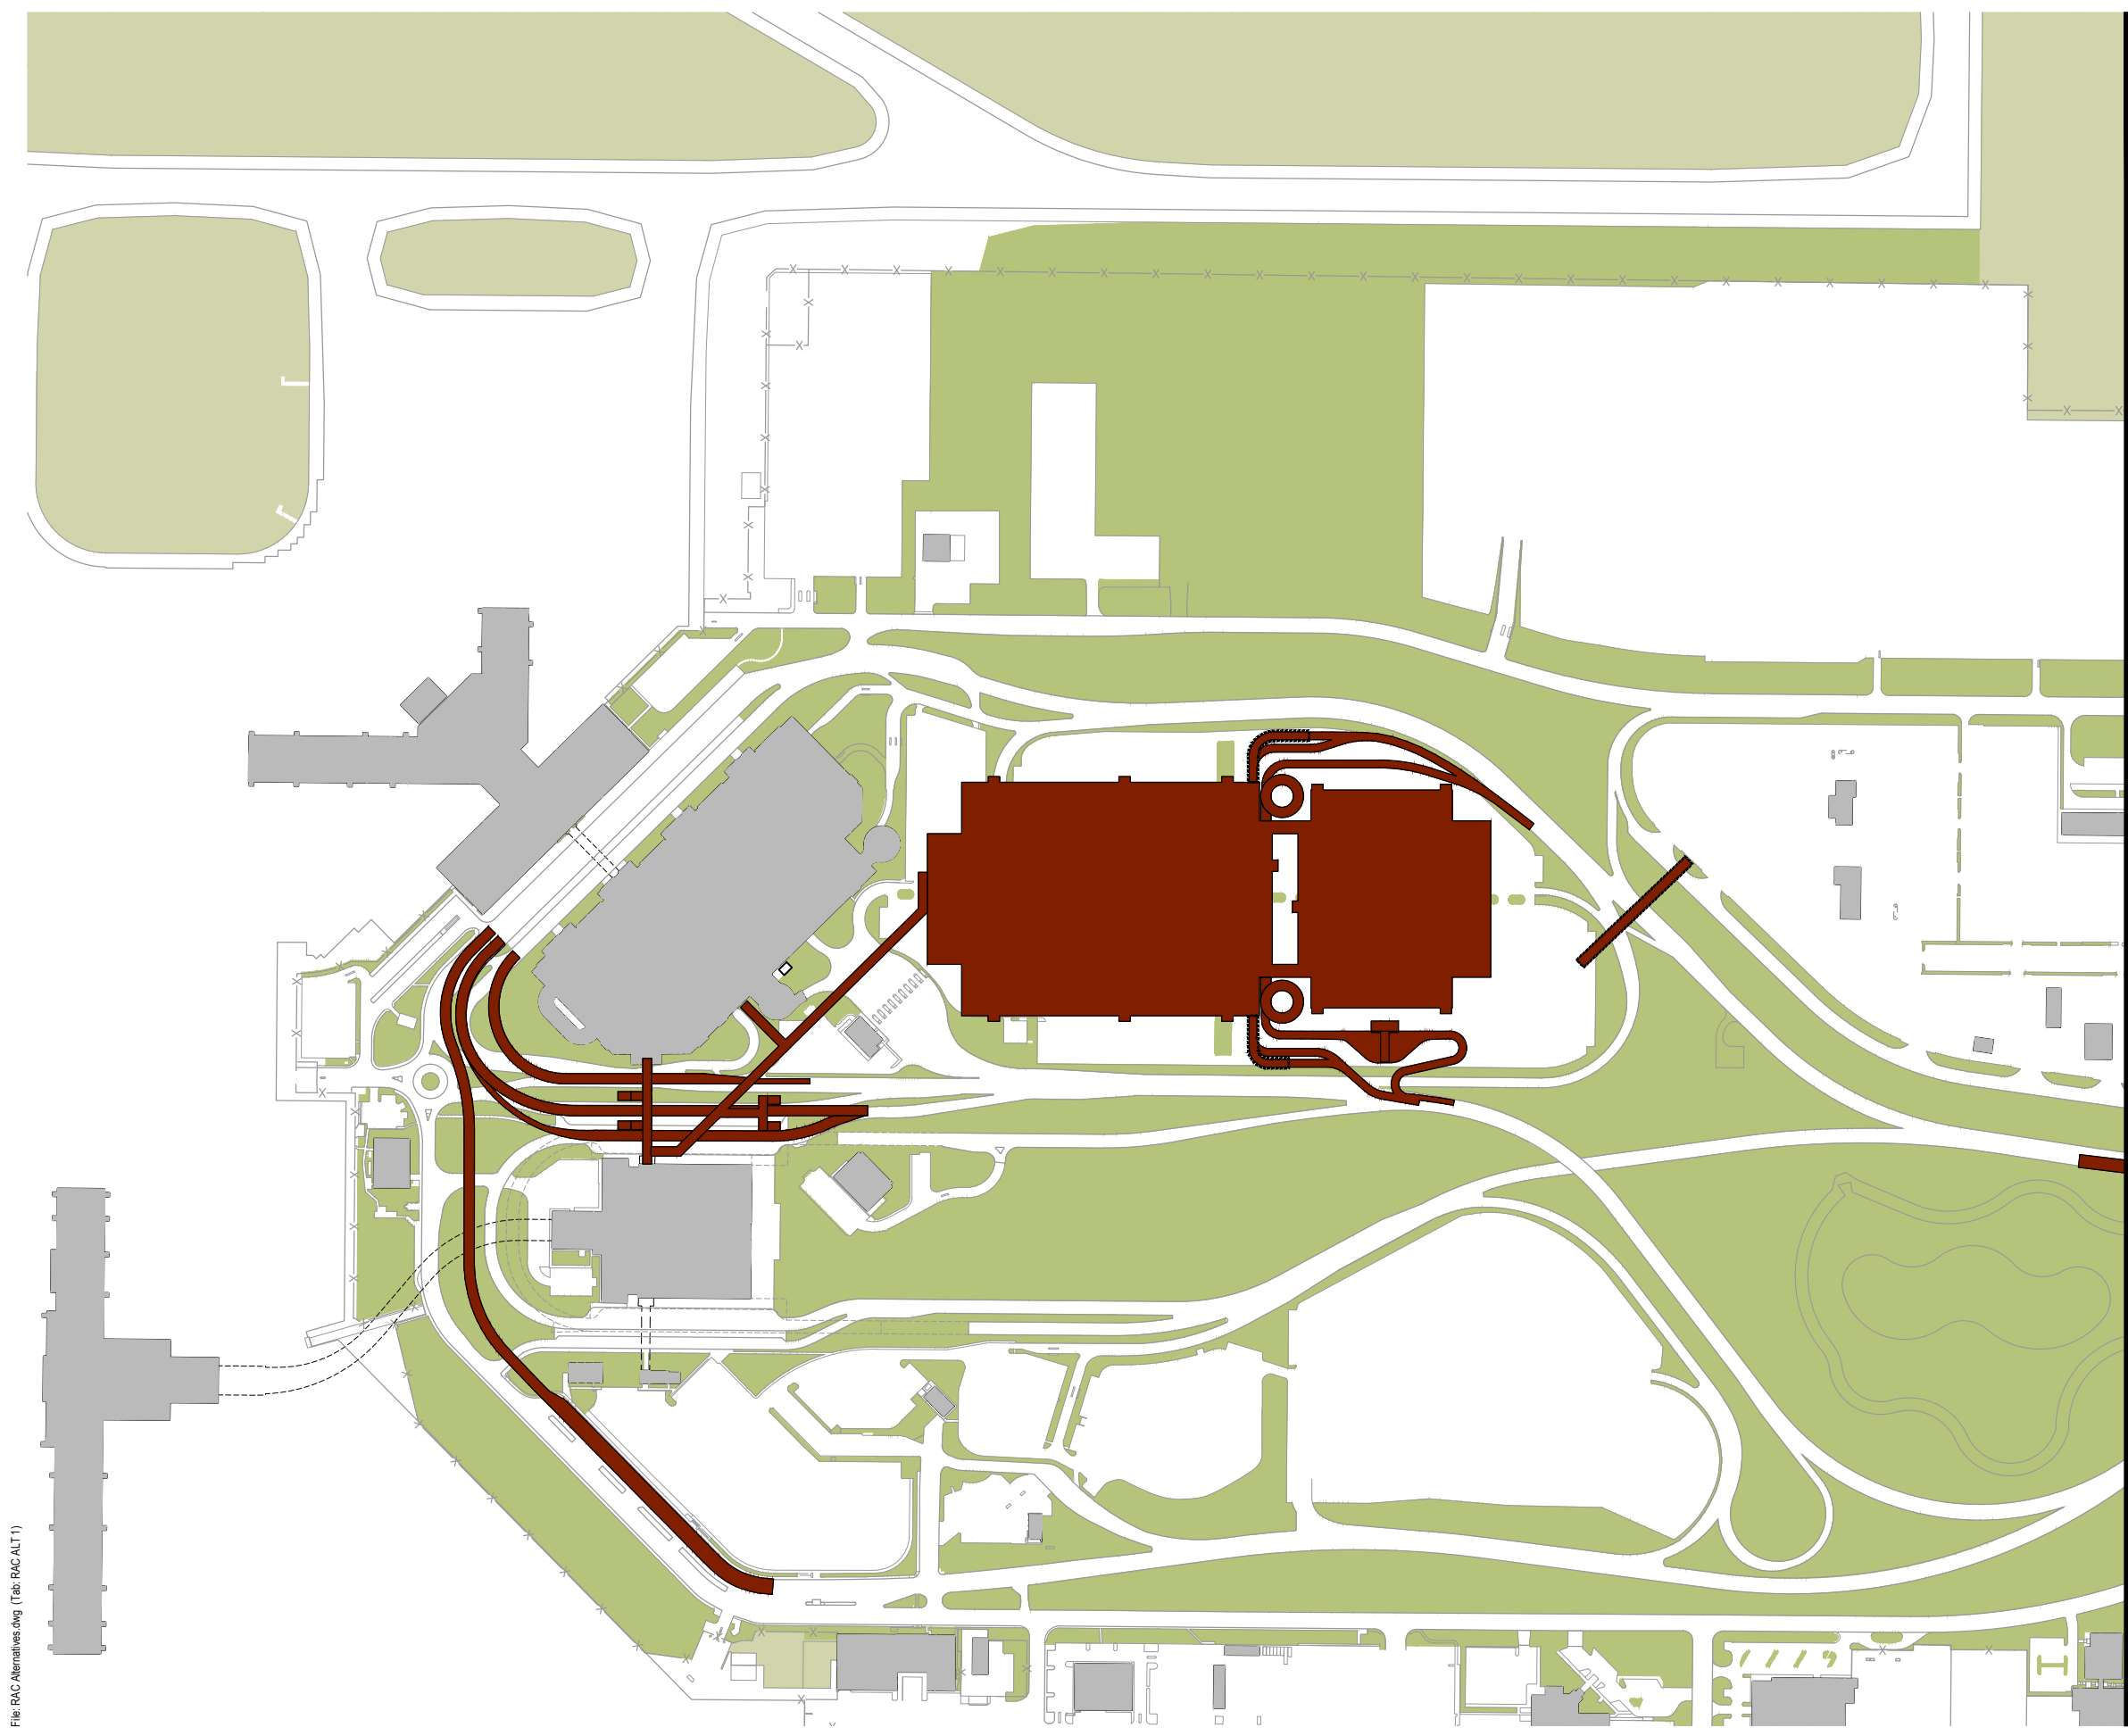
shows a potential entire replacement of the existing Terminal A parking garage with a combined ConRAC and public parking facility. The new replacement facility is ideally located adjacent to both Terminal A and Terminal B, minimizing walking distances for both RAC and public parking customers.
